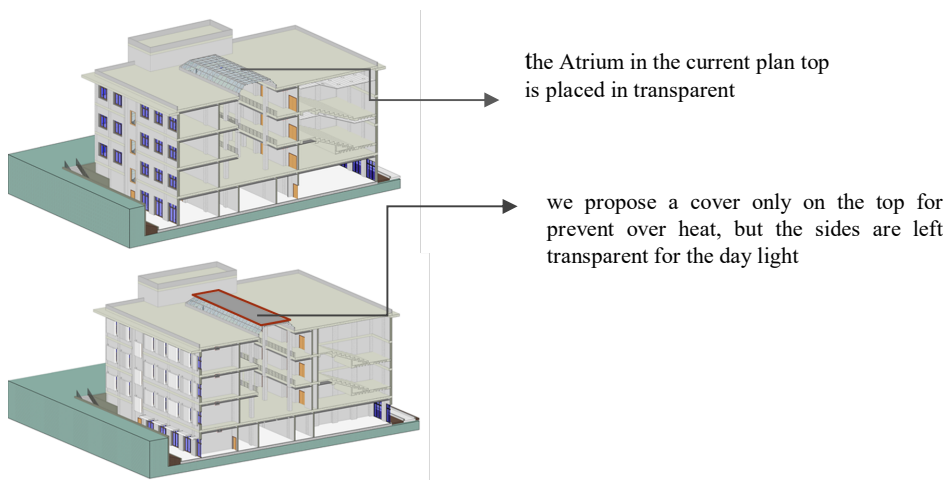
case study model sections indicate that the current Atrium design on the first scenario (top) and proposed roof covered by shading elements Atrium design on second and third scenarios (bottom)
